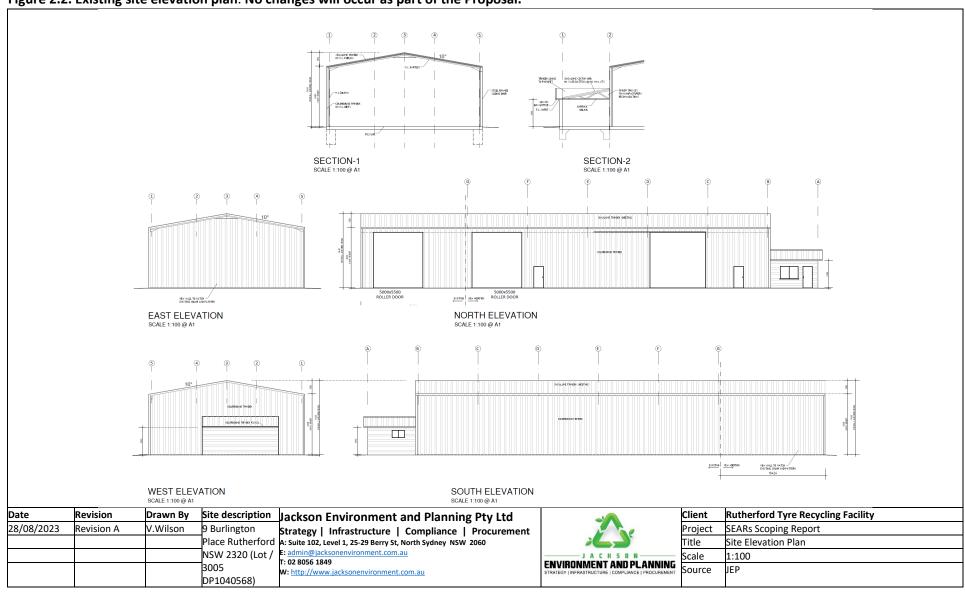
Existing site elevation plan. No changes will occur as part of the Proposal.
